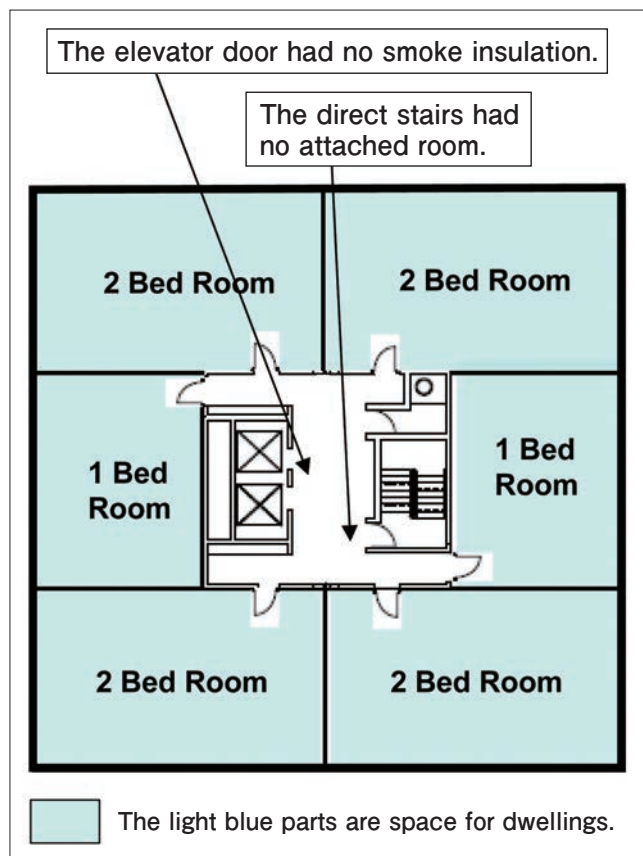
Floor plan of a standard dwelling floor in Grenfell Tower (This figure was made based on the plan shown in the Grenfell Tower Regeneration Project.)
